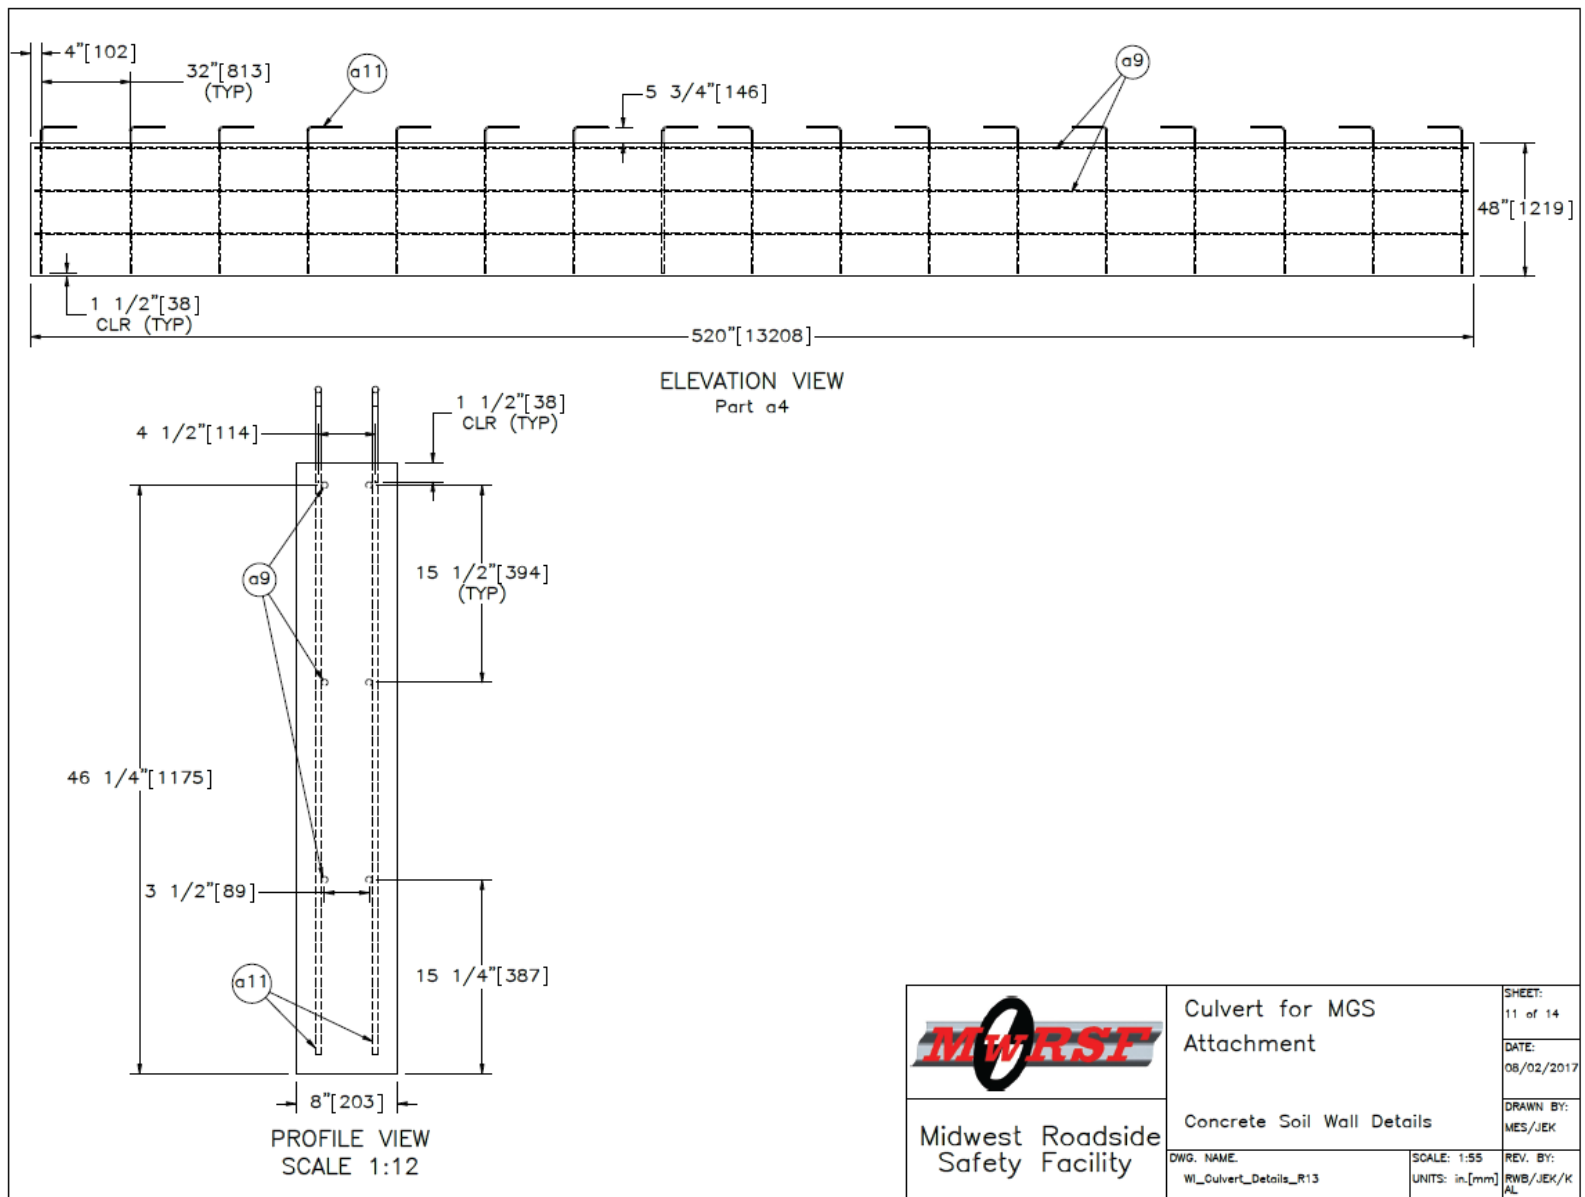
Concrete Soil Retaining Wall Details, Test Nos. CMGS-1 and CMGS-2
